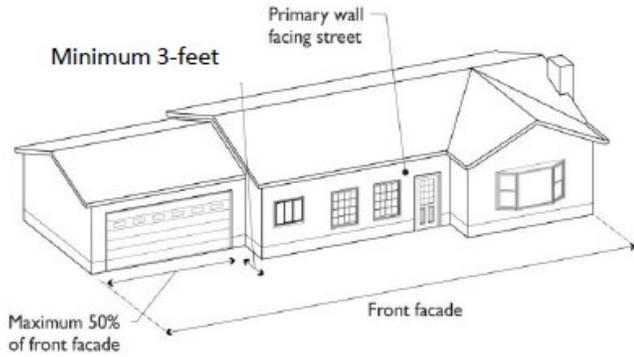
E.1: GARAGE FRONTAGE AND LOCATION
